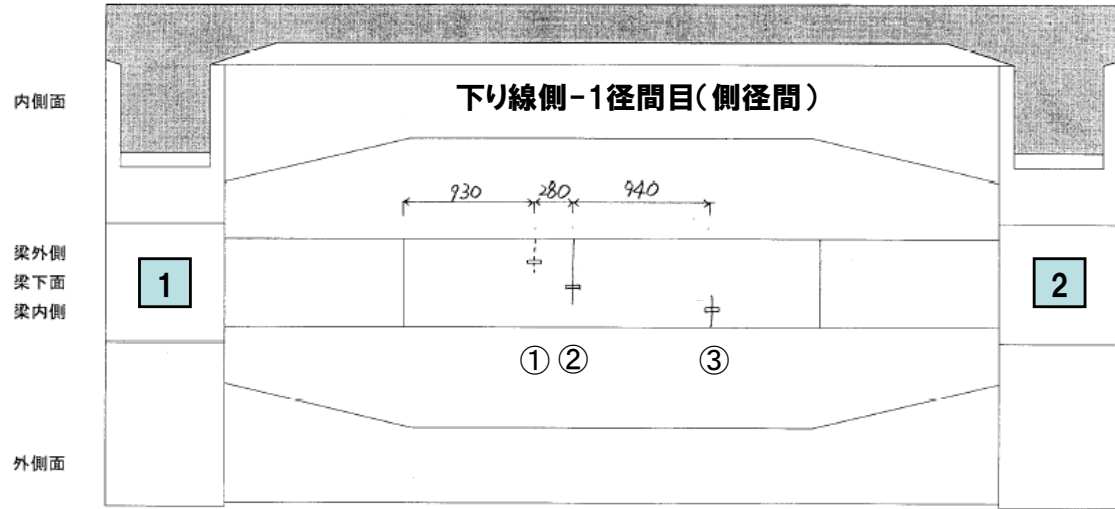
Distribution of cracks at longitudinal beams (Down line side)
